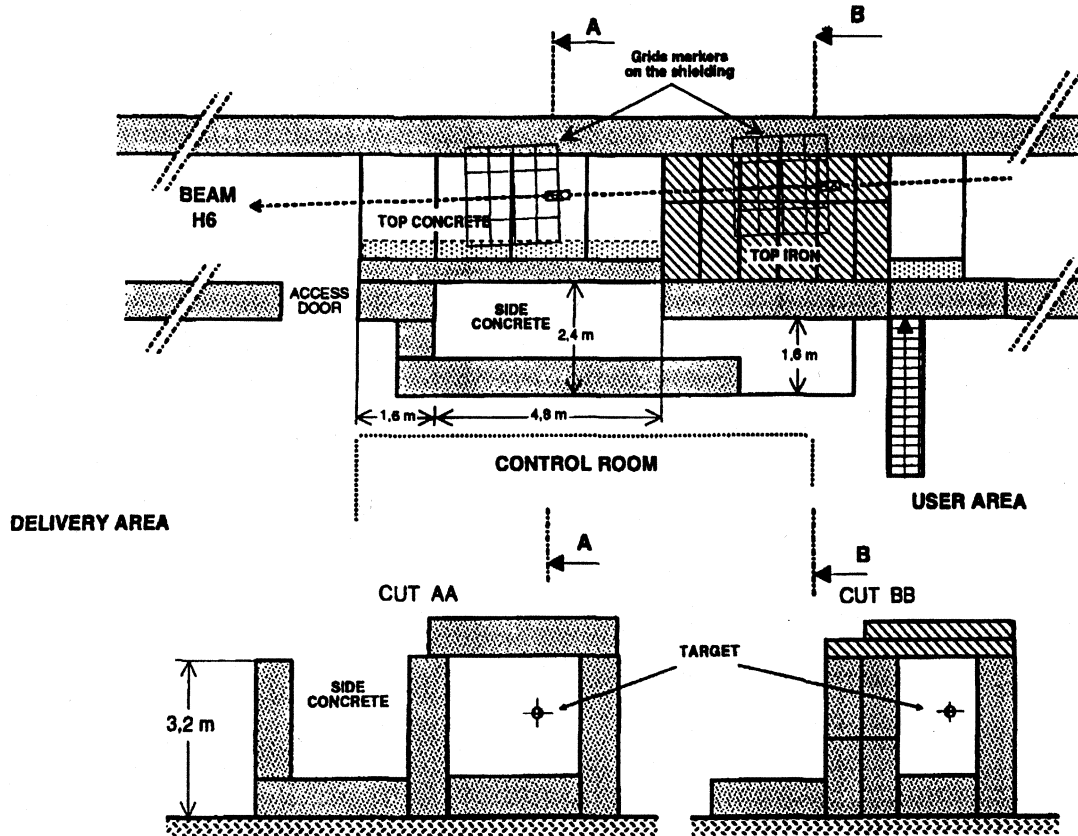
Plan and sectional views of the CERF facility [Nav97].
